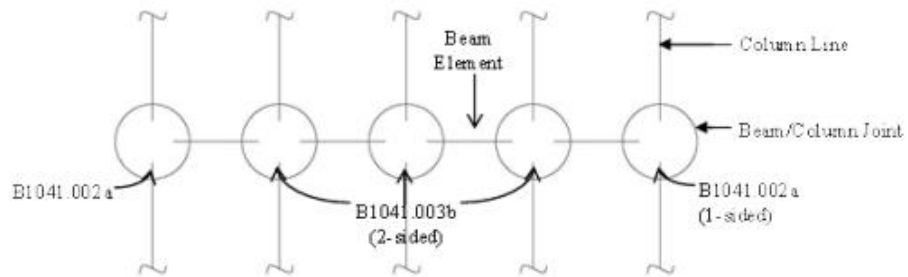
3: Reinforced concrete element fragility specification. (FEMA P-58)
